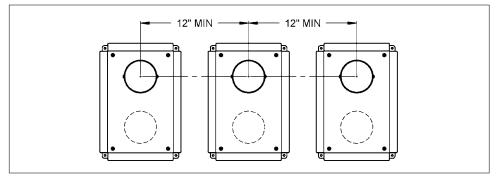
Minimum separation for multiple vent installation - vertical orientation
